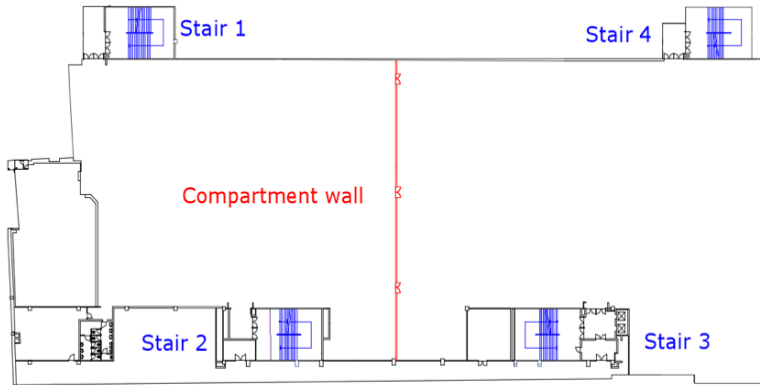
Ground plan of floor level 1 for option 2 with additional compartmentation.
